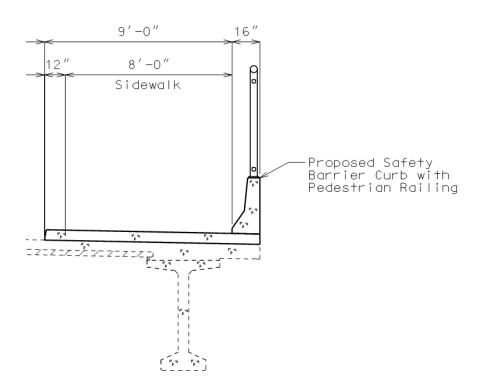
6-INCH RAISED SIDEWALK ALTERNATIVE
